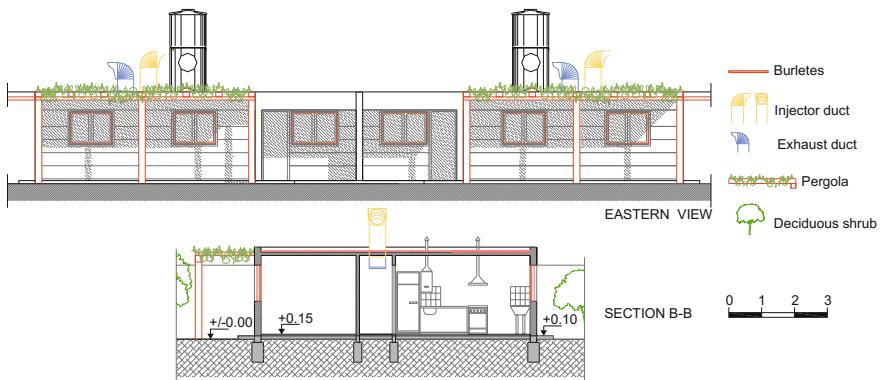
Façade and cross section of the houses with proposed improvements of alternative F
